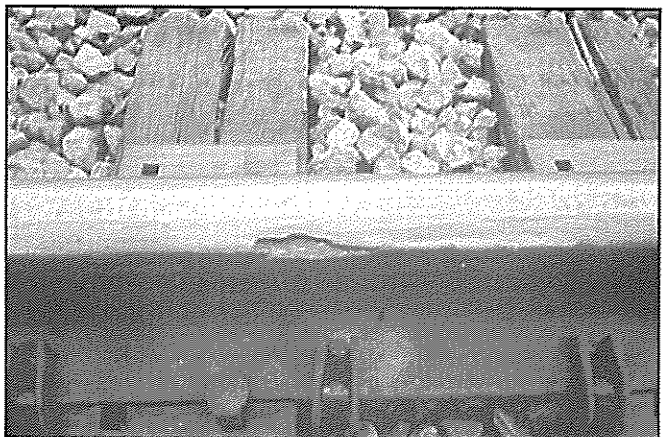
Gage Corner Shelling, on the other hand, is a progressive internal separation that can 'crack out.'
